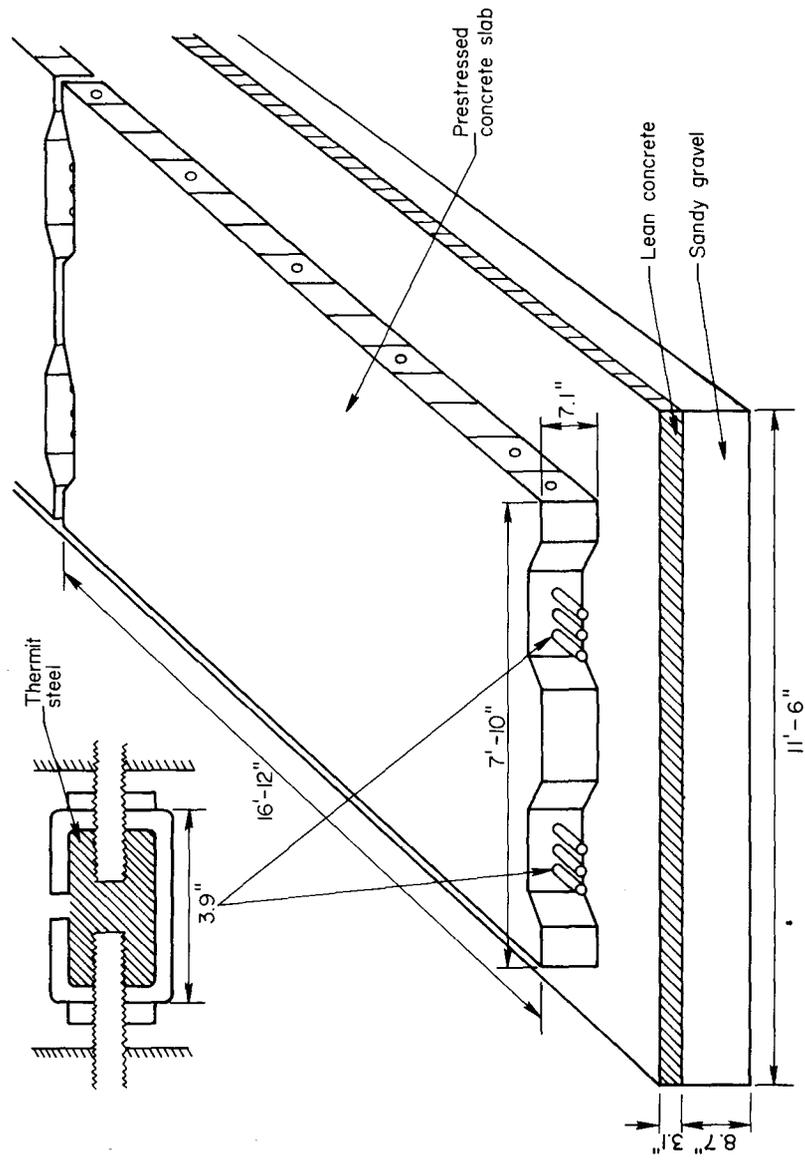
PRECAST CONCRETE SLABS ON SANDY-GRAVEL SUBBASE
